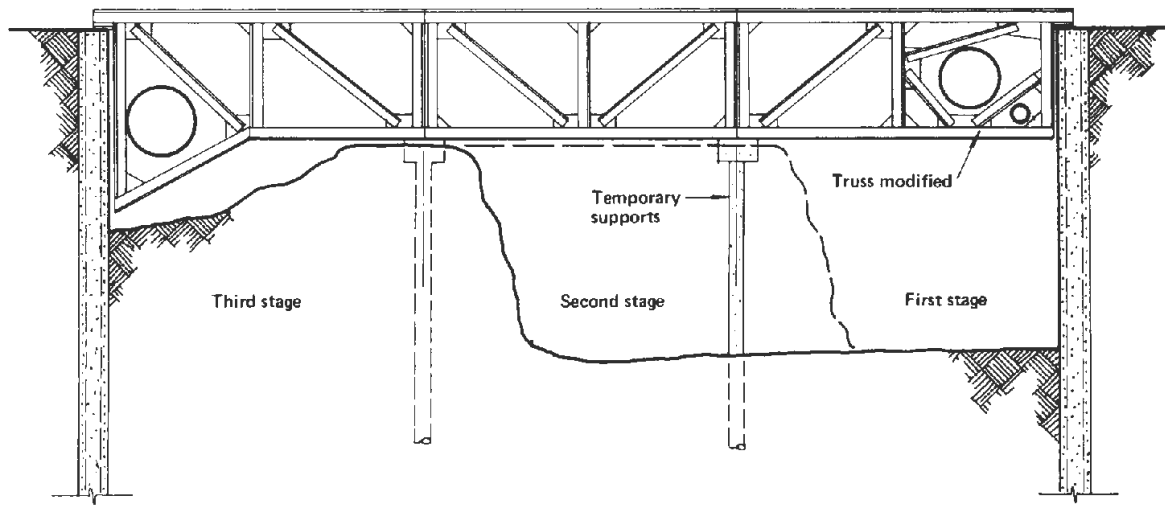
Stage construction and field modification of steel trusses to accommodate existing utilities.
